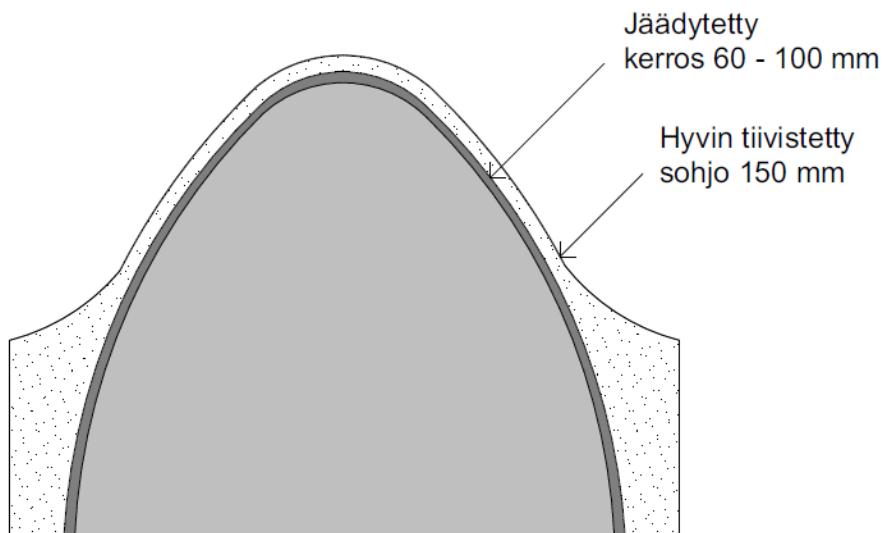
Example of the structural strengths of a large slush structure (Riikonen 2009)
